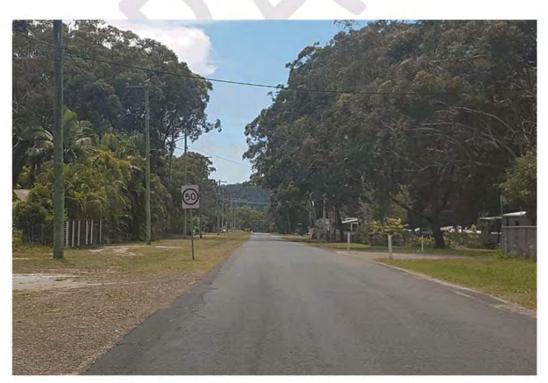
Eastbound view along Minjerriba Road mid-way between the High Street and Centre Road intersections (Segment 1).
